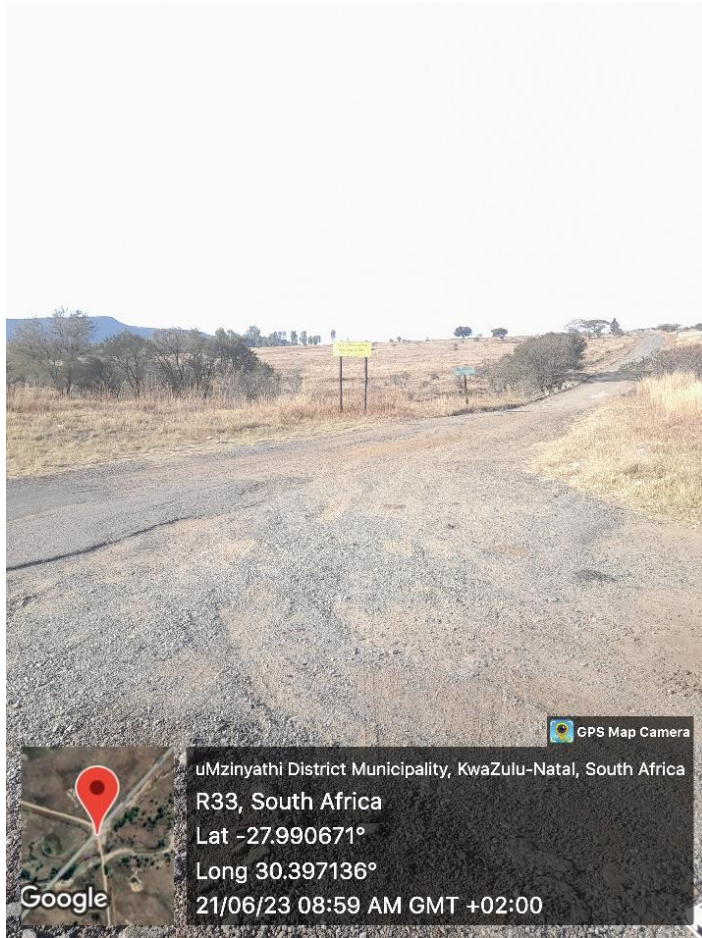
Access road to the proposed site (Singo Consulting (Pty) Ltd, 2023)
